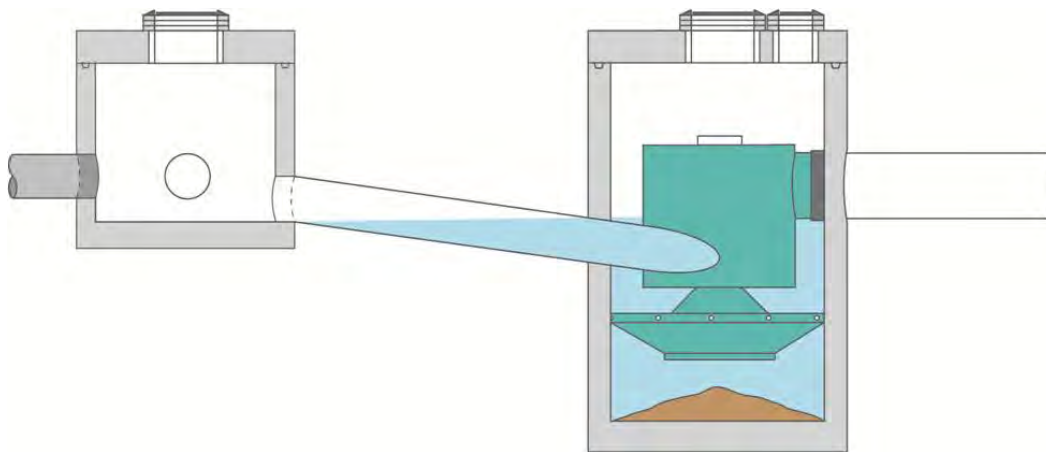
Inlet Crown of the Downstream Defender Set at the Same Elevation as Outlet Pipe Invert
